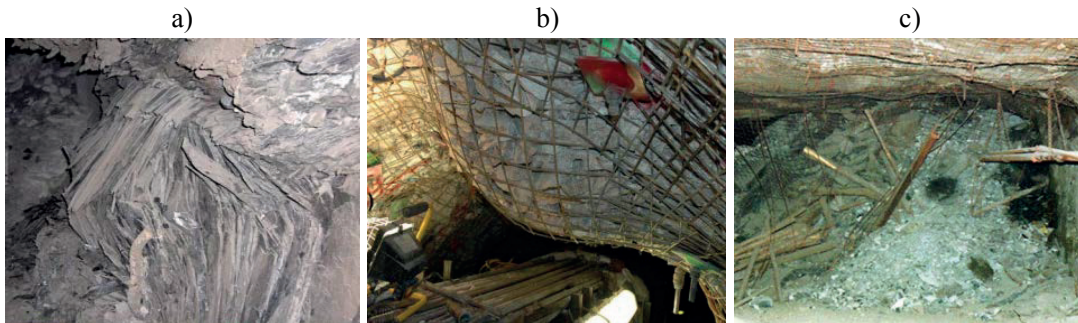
Examples of structurally controlled instabilities in fault zones: a) highly anisotropic failure at the tunnel sidewalls due to the presence of well-developed foliation or sub-parallel fractures with small spacing; b) progressive block destabilisation at the tunnel walls/crown; c) complete collapse resulting from total loss of confinement; after (Loew et al., 2010).
